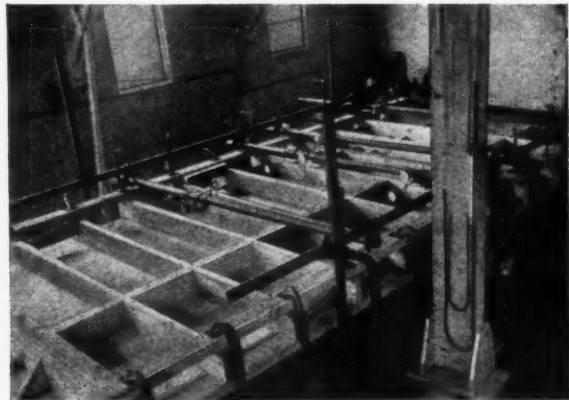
Rig for static loading tests. (Floor section is inverted, with captive airbag beneath for loading.)
